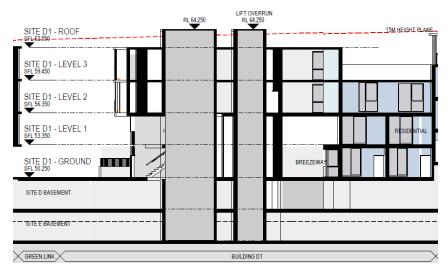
Height breach to Site D (Source: Rothe Lowman plans)
